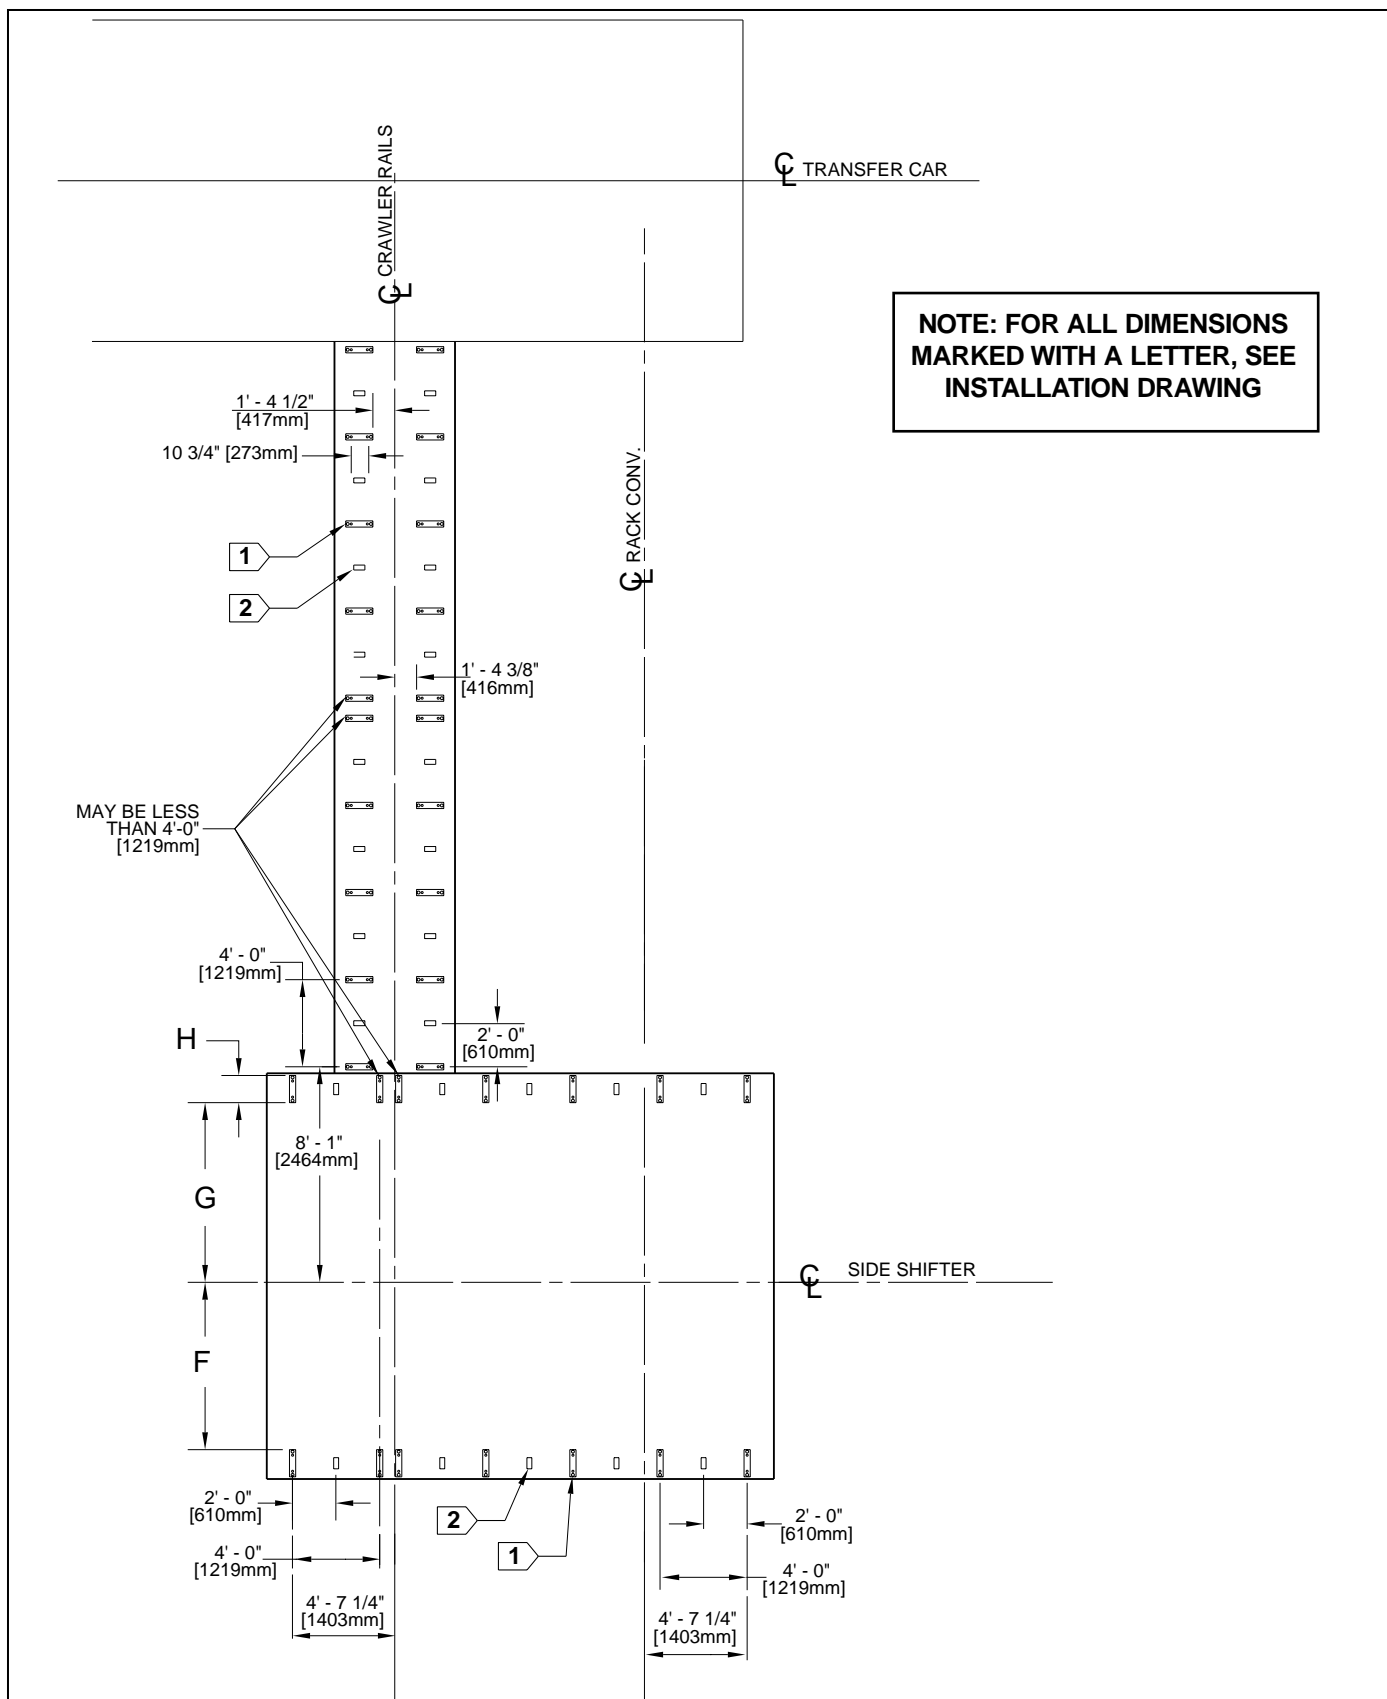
SIDE SHIFTER AND CRAWLER ANCHOR PLATES AND SHIMS INSTALLATION.
